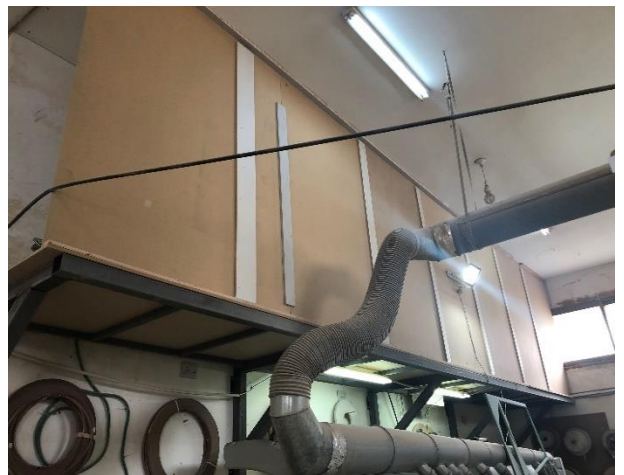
Reassembling Loft C next to B and the installation of the new siding
